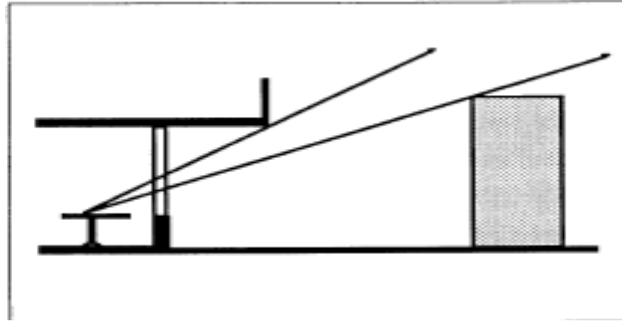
Cantilever or roof overhang used for shading of north facing window in Khartoum City
